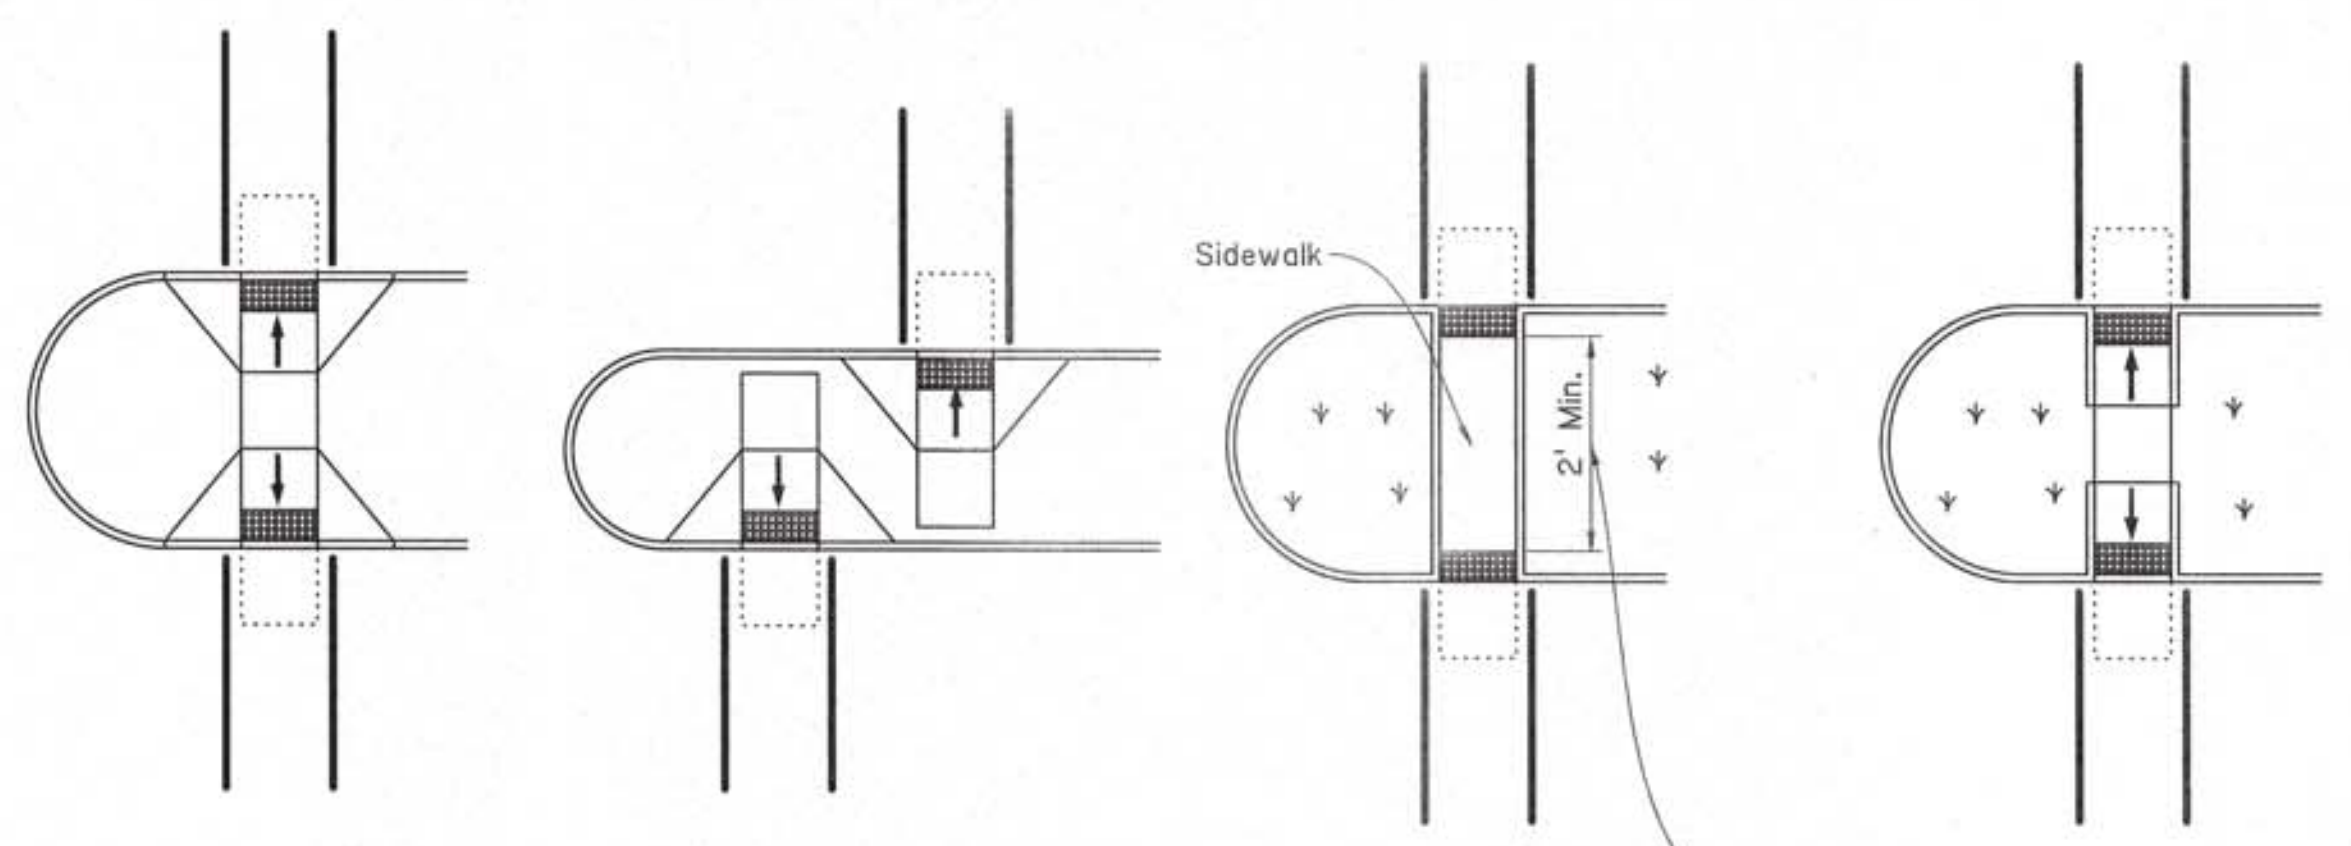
DETAIL E: CURB RAMP PLACED AT MID-BLOCK CROSSING
